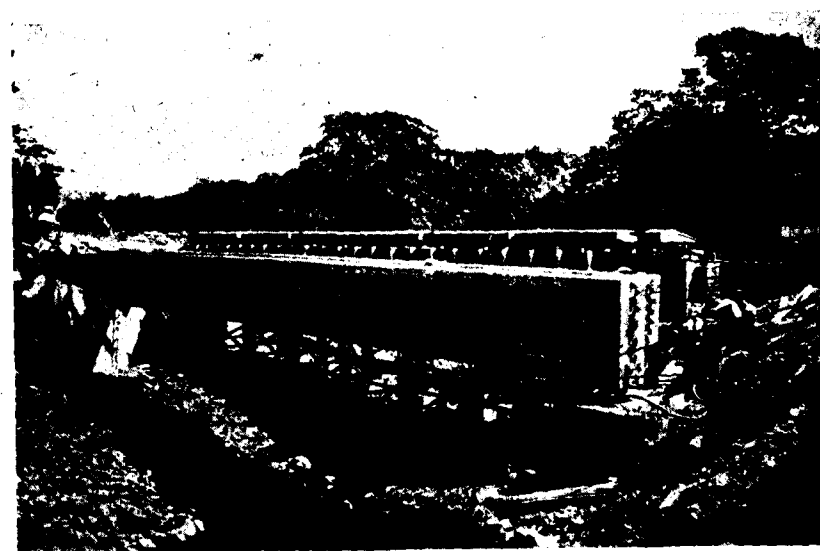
Abercrave Bridge—Precast beam completed and moved to its final position
